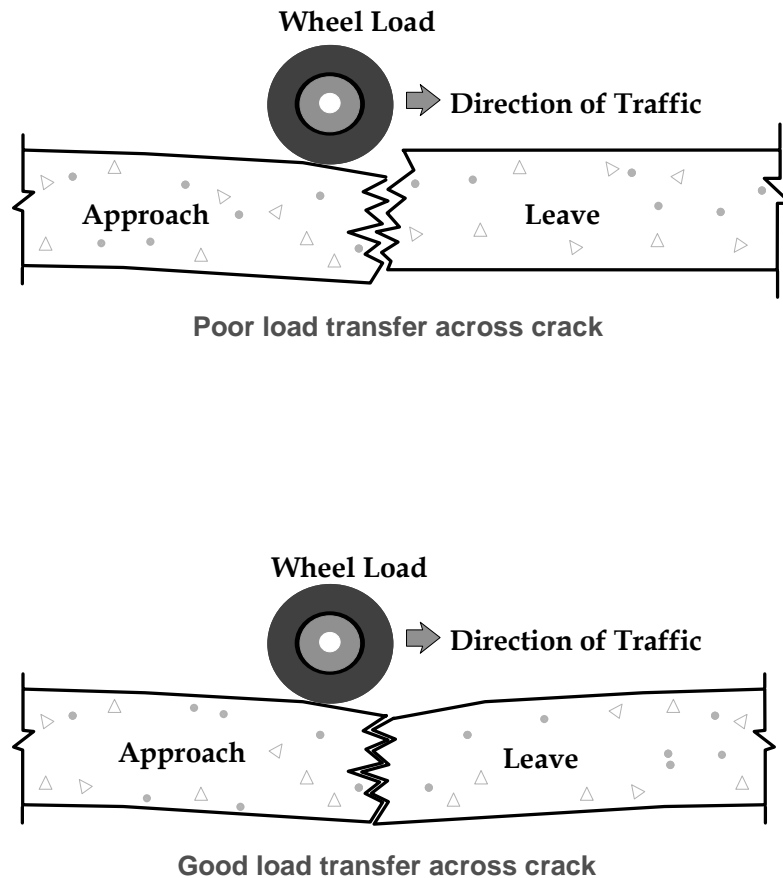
Illustration of poor and good load transfer across a crack in a joint concrete pavement.
